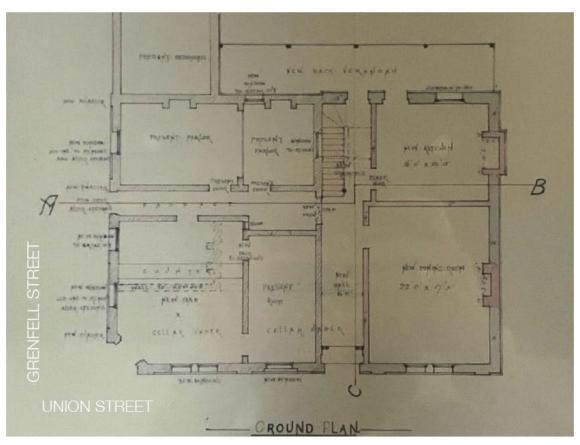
Part Ground Floor Plan, Crown and Anchor Hotel Contract Drawing, 1879 Source: State Library of South Australia, B 58651
